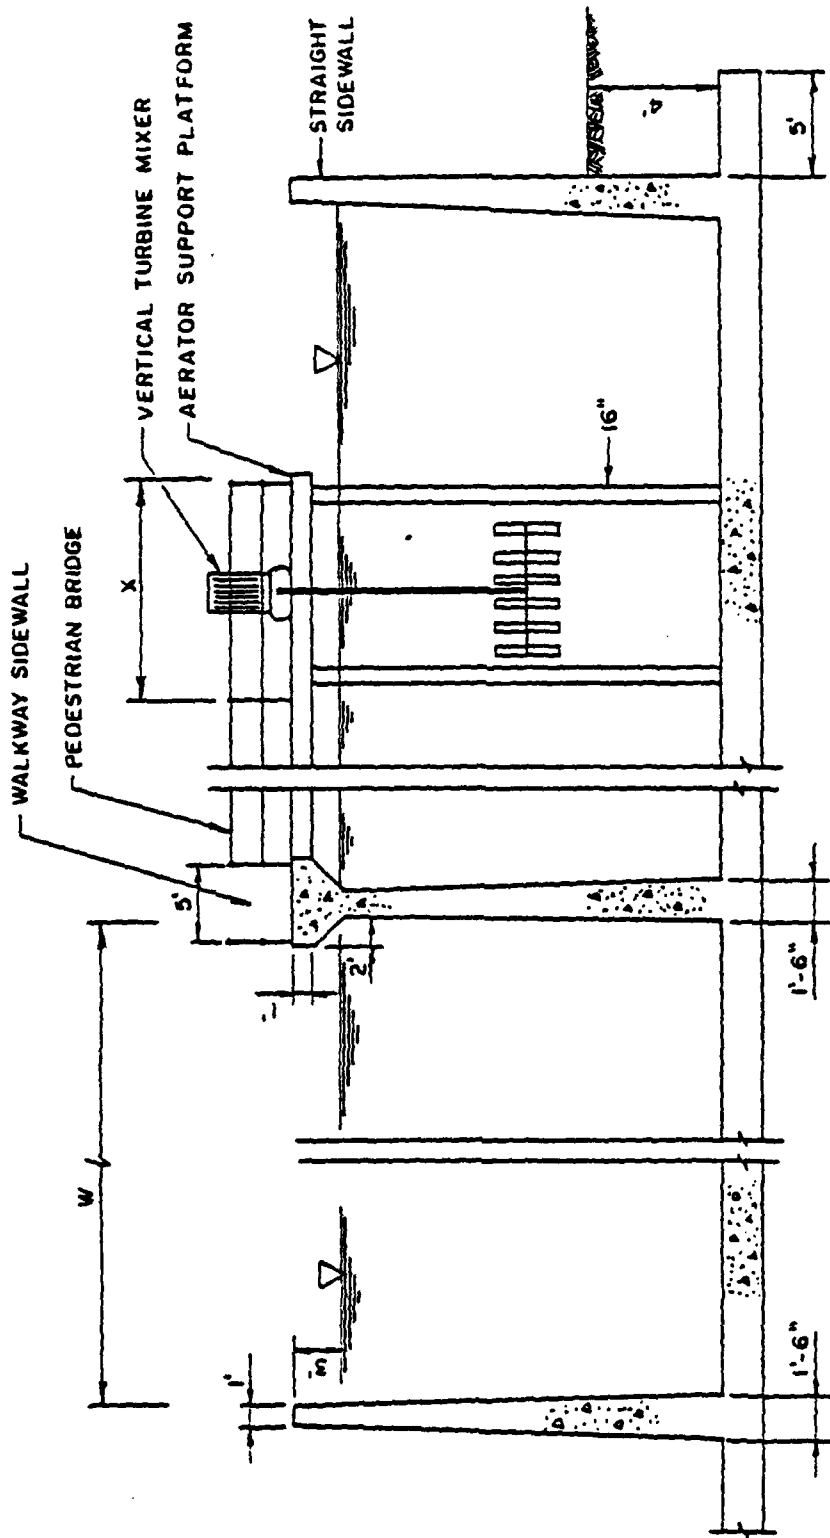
TYPICAL SECTION OF PLUG FLOW DENITRIFICATION TANKS
